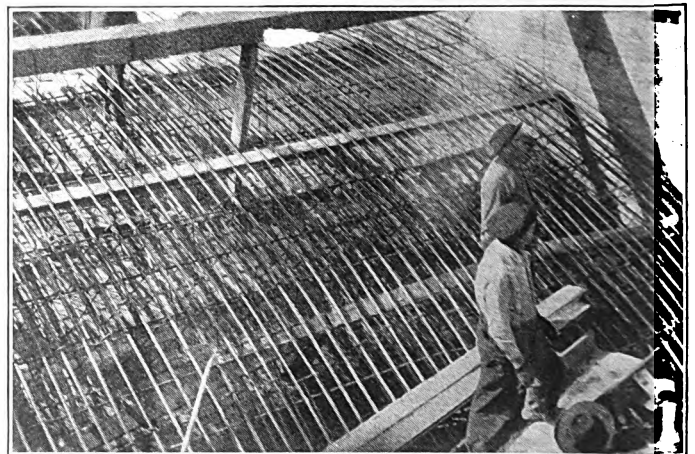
Reinforcing Bars In Concrete Arch, C., M. & St. P. Ry.
